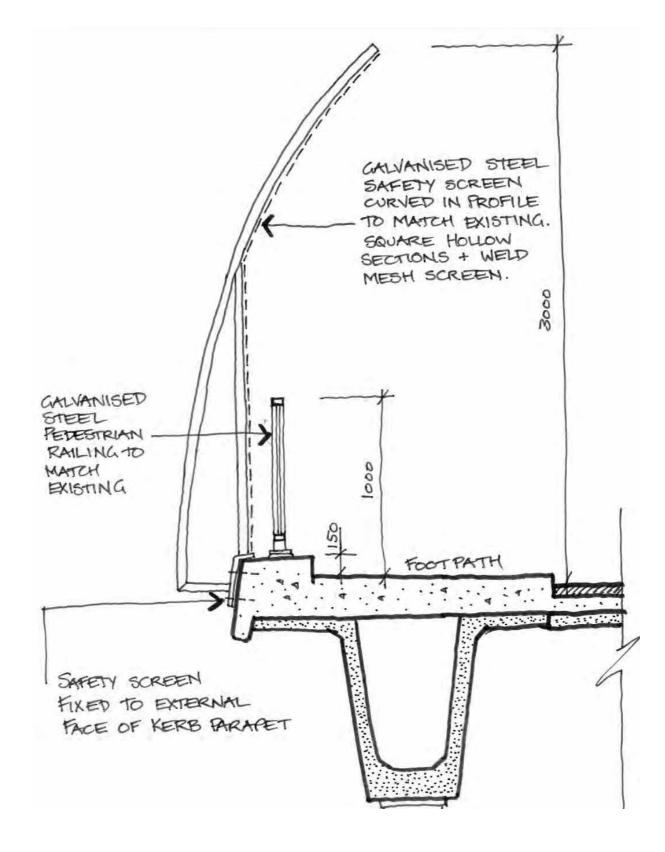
Typical Bridge - Parapet Detail on Christie Road Bridge
